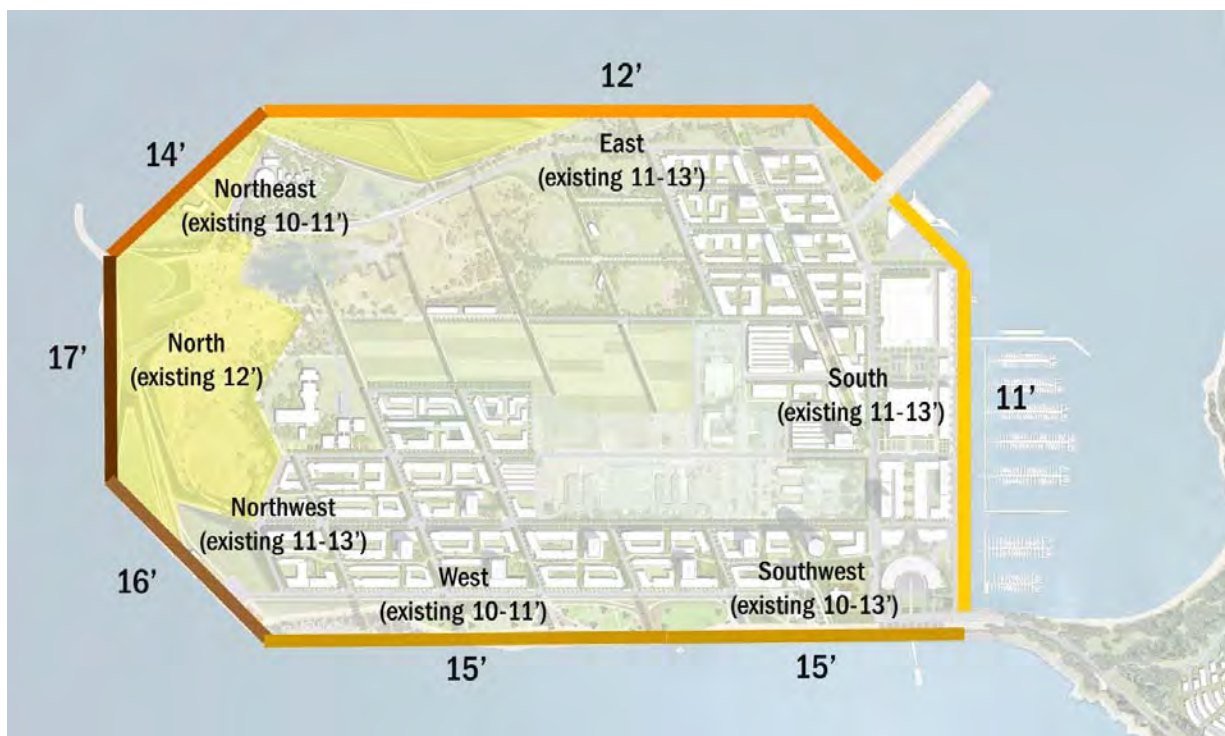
Reaches Applicable to Specified Berm Crest Elevations
